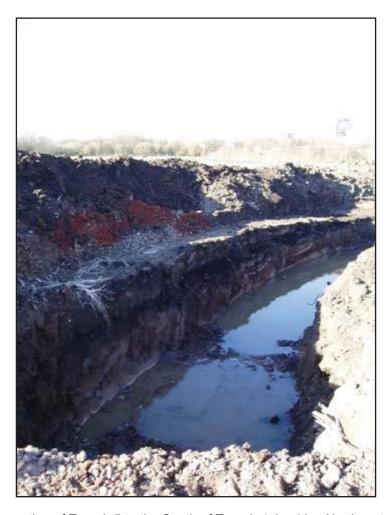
Excavation of Trench 5 to the South of Trench 4; Looking Northeast. No Scale.
